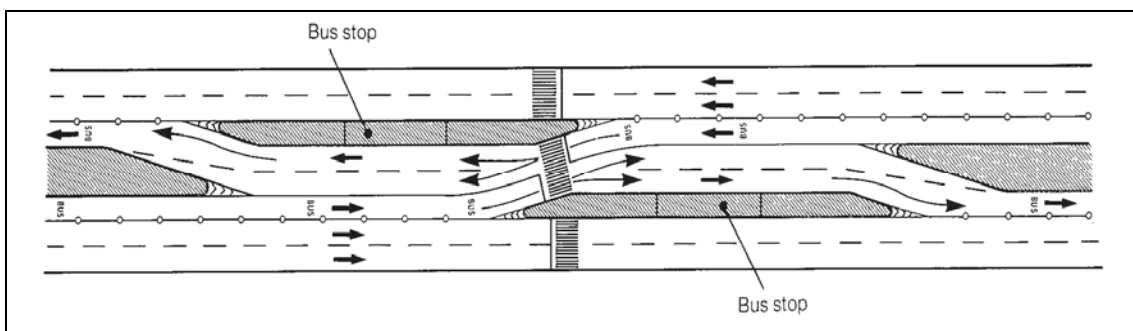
Typical Bus Stop Layout, Avenida 9 de Julho, Sao Paulo, Brazil (Shen 1998)
